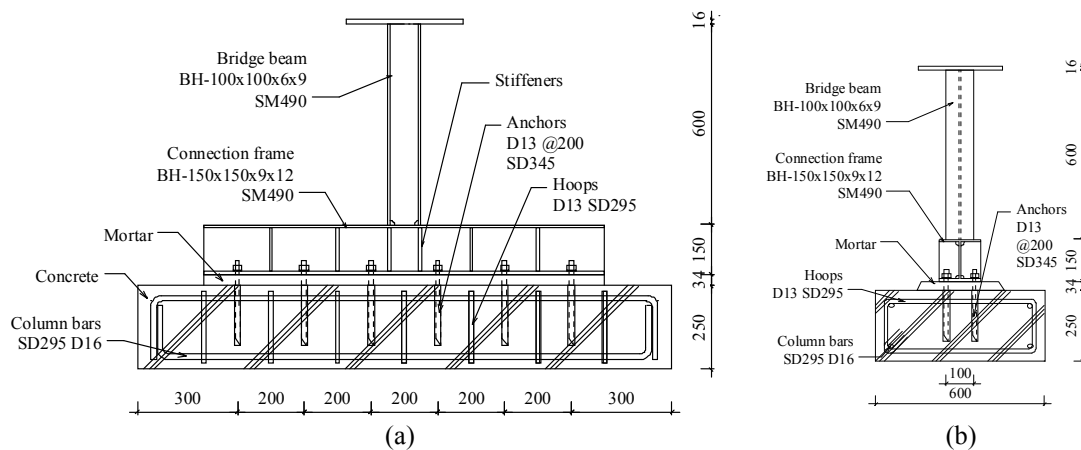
shows an elevation view of the test specimens. The top of the bridge beam was laterally loaded to produce the bending moment at the connection joint. The R/C element is fixed on a reaction frame.
